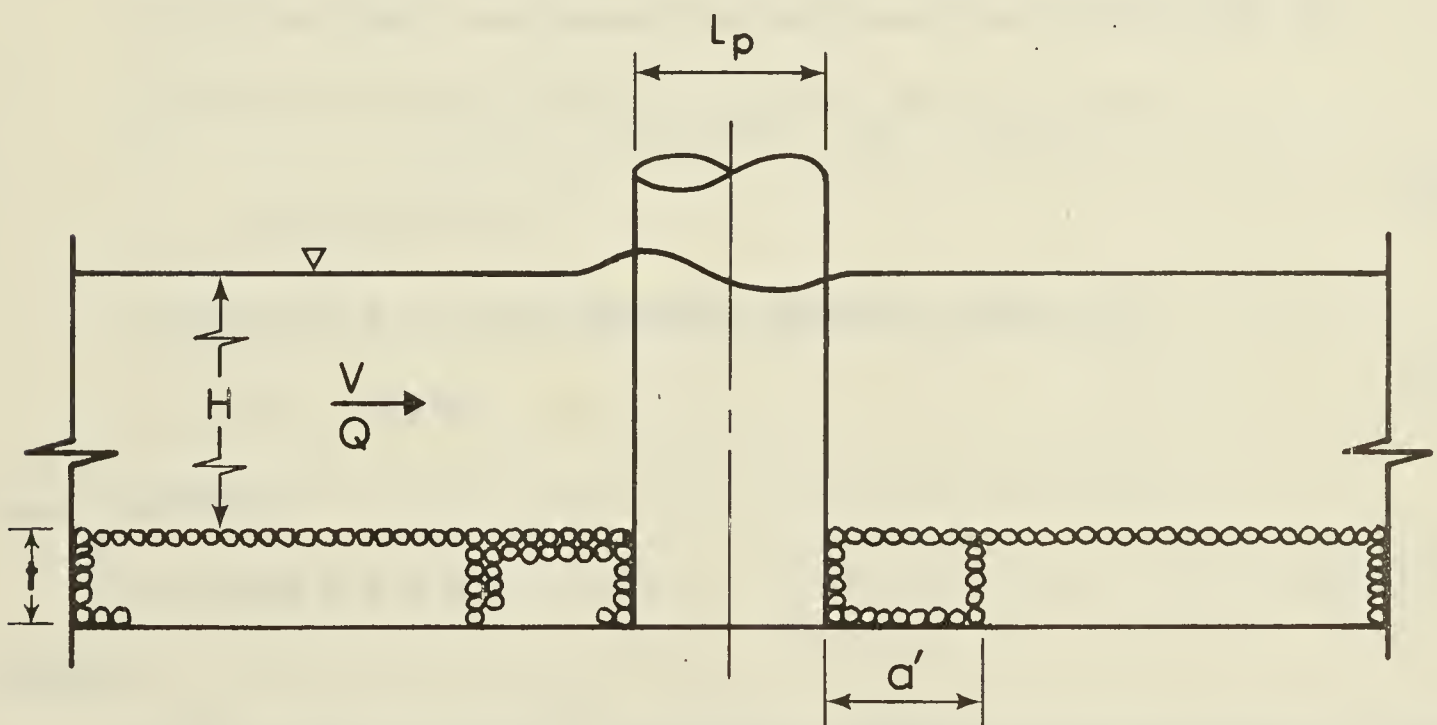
(a) SECTION THROUGH TEST PIER
